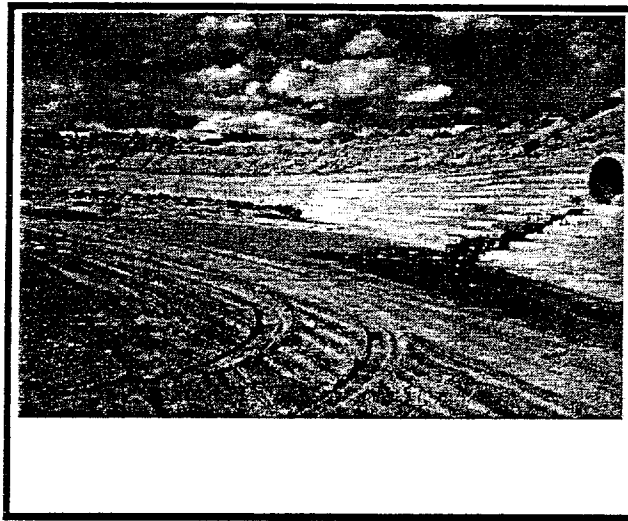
Soil cement bank protection, Calabacillas Arroyo.
